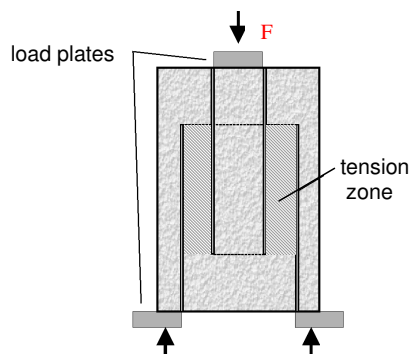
General testing layout and sample geometry for the Modified Tension Test.
